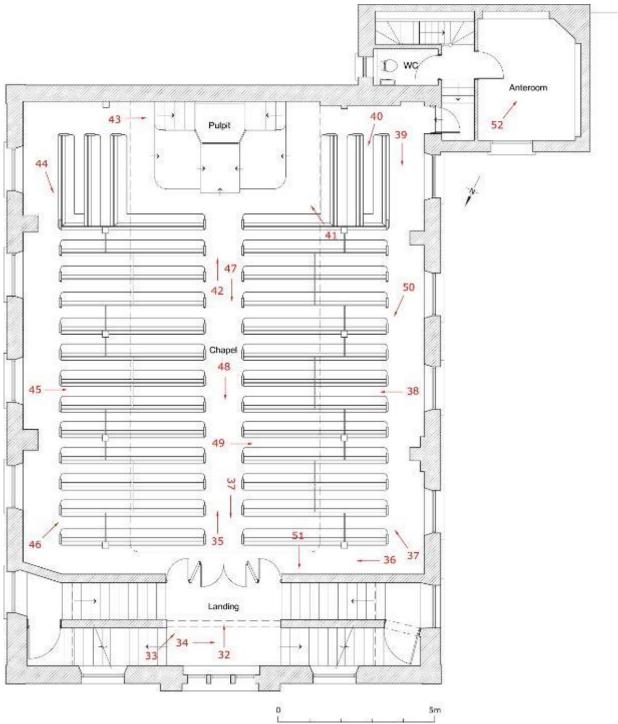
Plan showing location and direction of photographs taken on the first floor (plan supplied by client)
